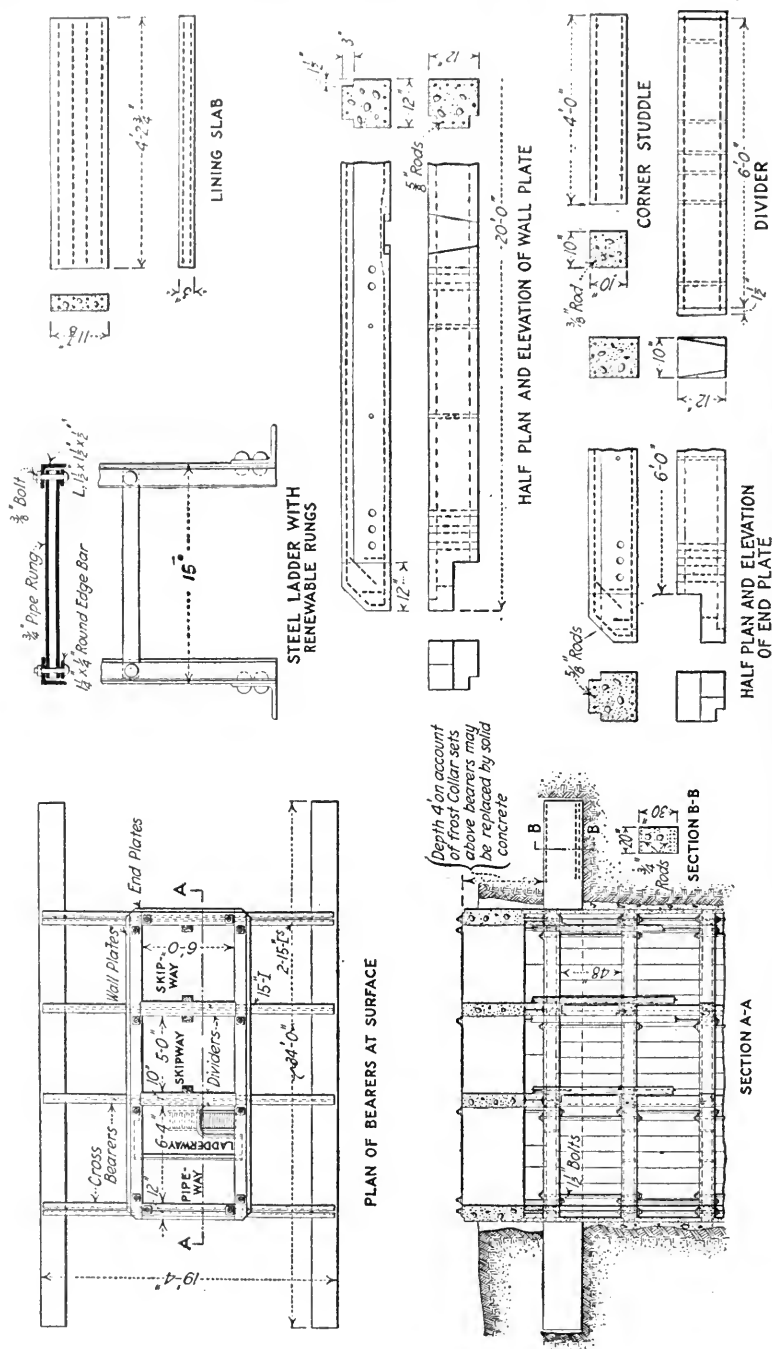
SHAFT ARRANGEMENT AND DETAILS OF SHAFT MEMBERS.
